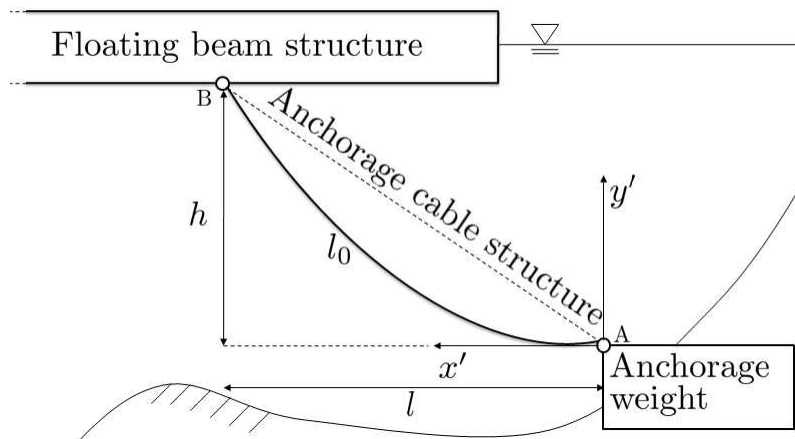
Situation of the floating structure before anchoring the system to the seabed
